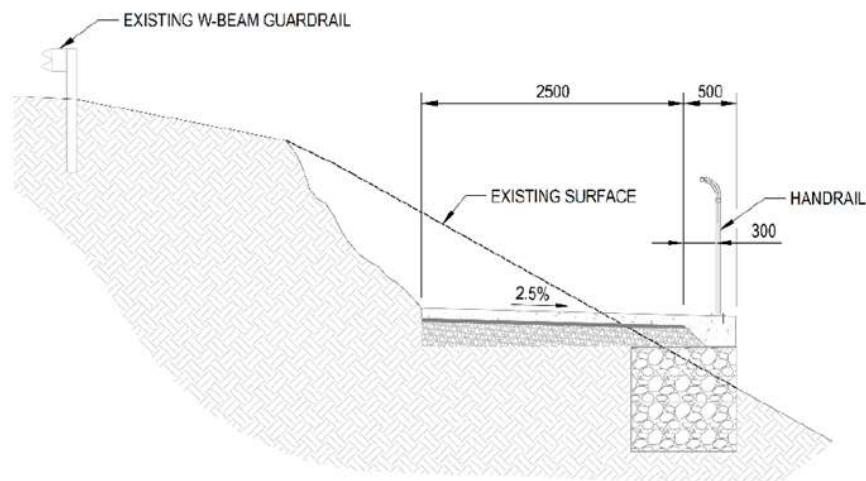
Typical cross-section where there is no verge behind guardrail (from fishing platform to southern extent of Stage 1 works)
